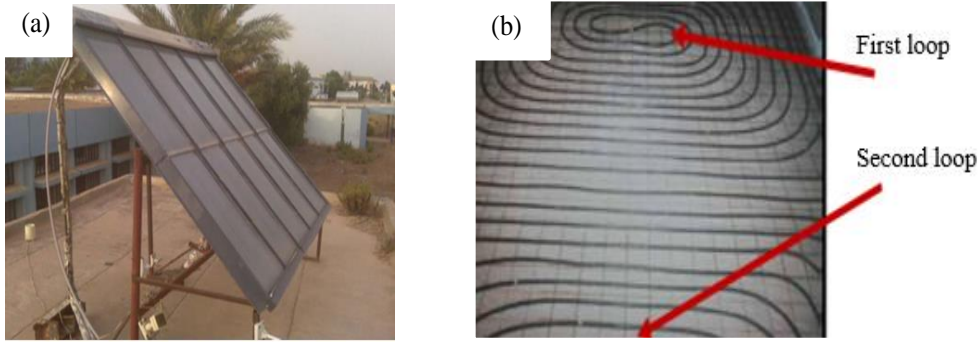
(a) Thermal solar collector, (b) Floor heating hydraulic circuit configuration[2].
